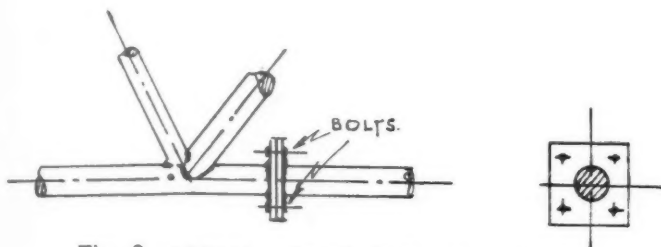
DETAIL. JOINT FOR SMALL SPANS.
